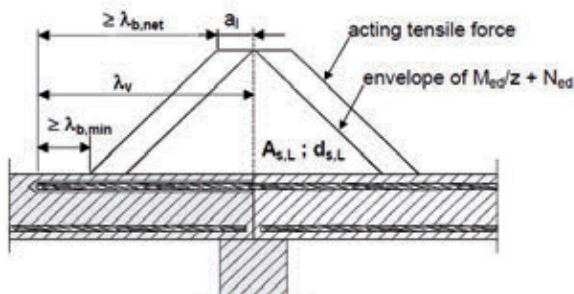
Anchoring of reinforcement to cover the line of acting tensile force
